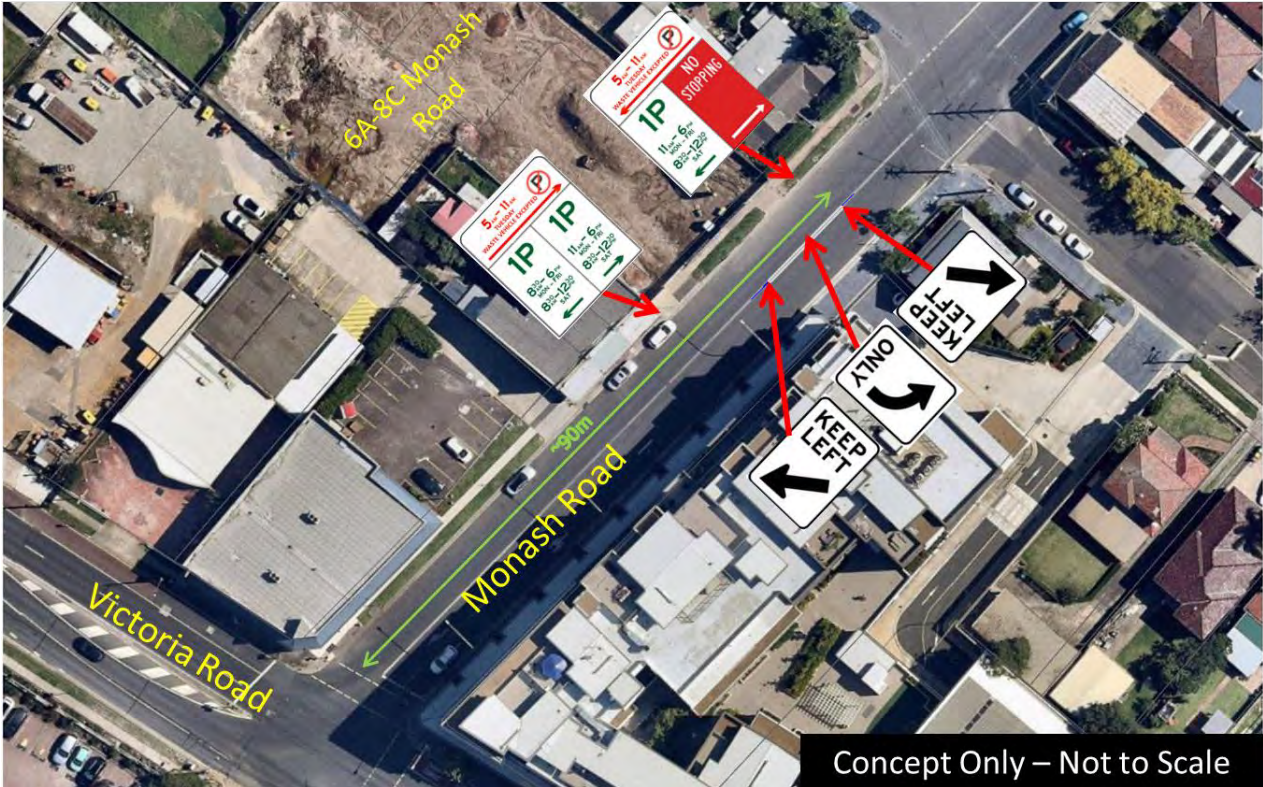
Aerial View of 6A – 8C Monash Road with the proposed median strip and No Parking Zone
